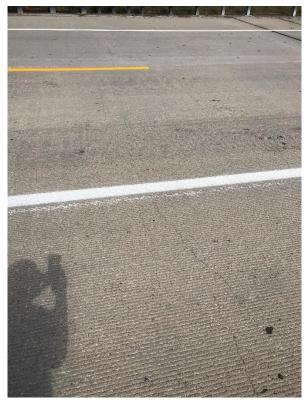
Little Sandy Creek bridge approach slab and paving section cracking
